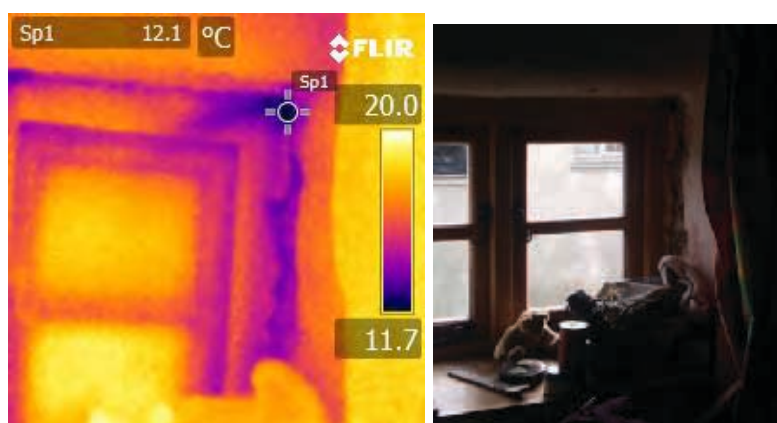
The Firs, Riddlecombe – Bedroom 1, south facing wall.
